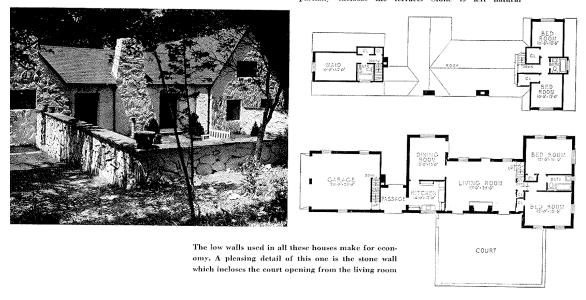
Floor Plan, "Floor Plan." House Beautiful, October 1935: 75.
